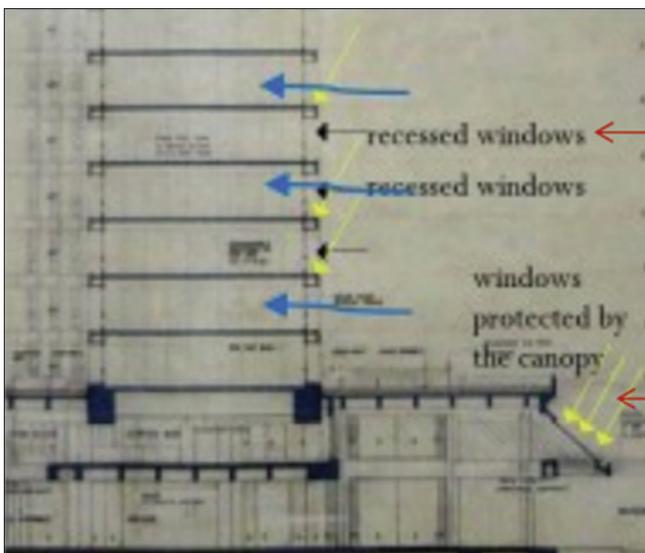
Section and façade of the ICEA building showing operable windows, recessed shading, and high thermal mass
